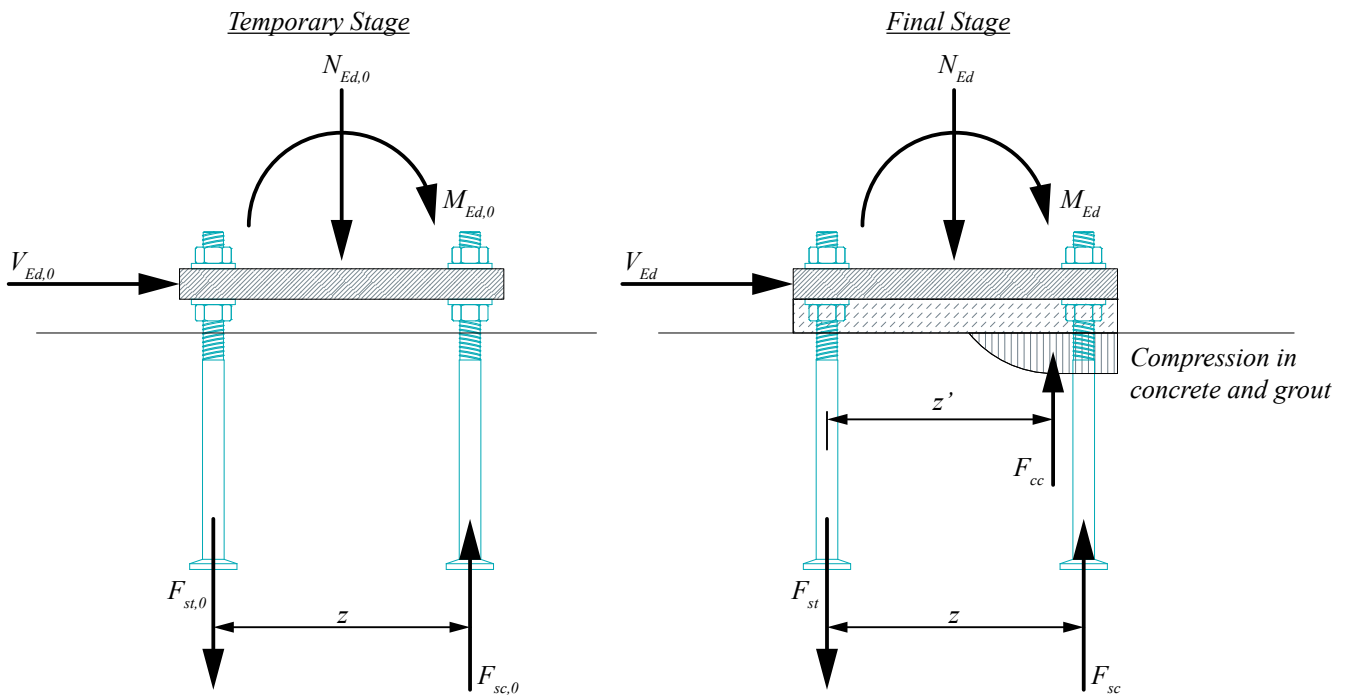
Structural behavior of the bolted connection under temporary and final conditions.
